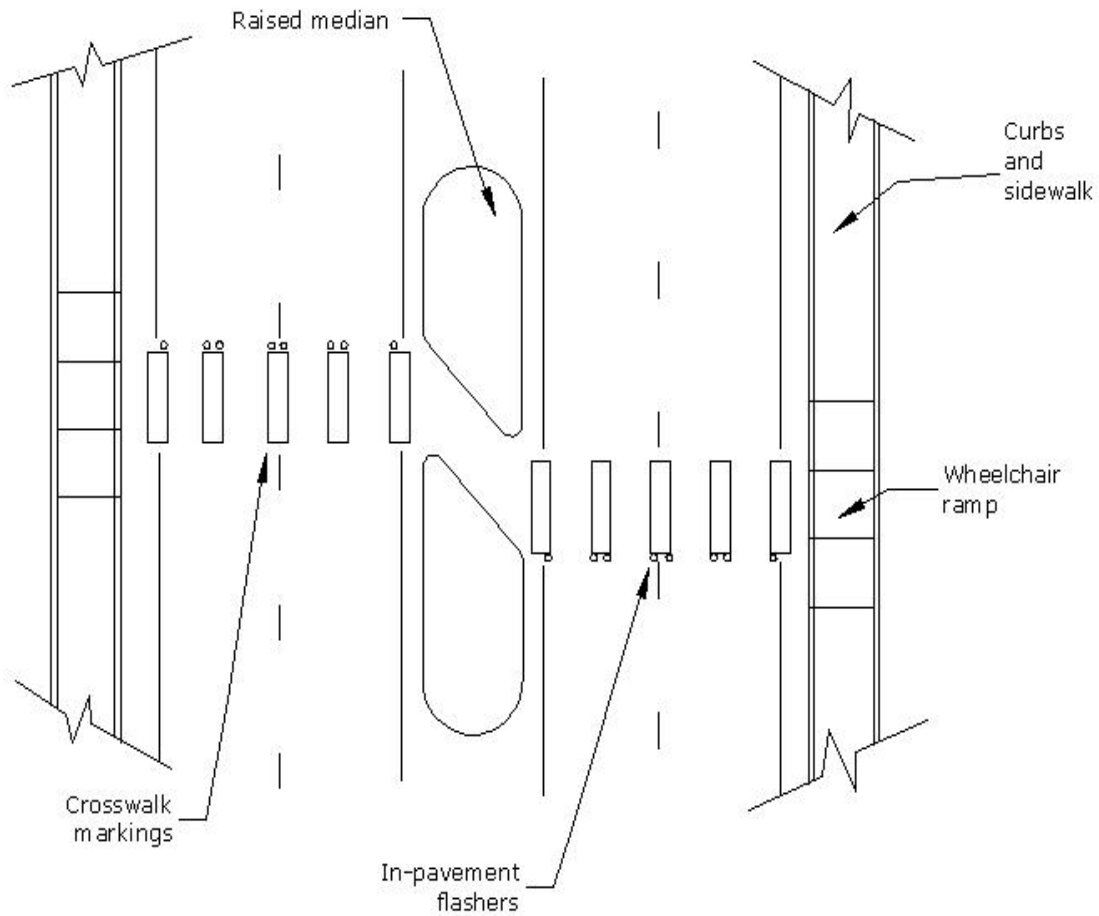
Detail of crosswalk/raised median—before condition (plan view) —Airway Heights (WSDOT 2007)
